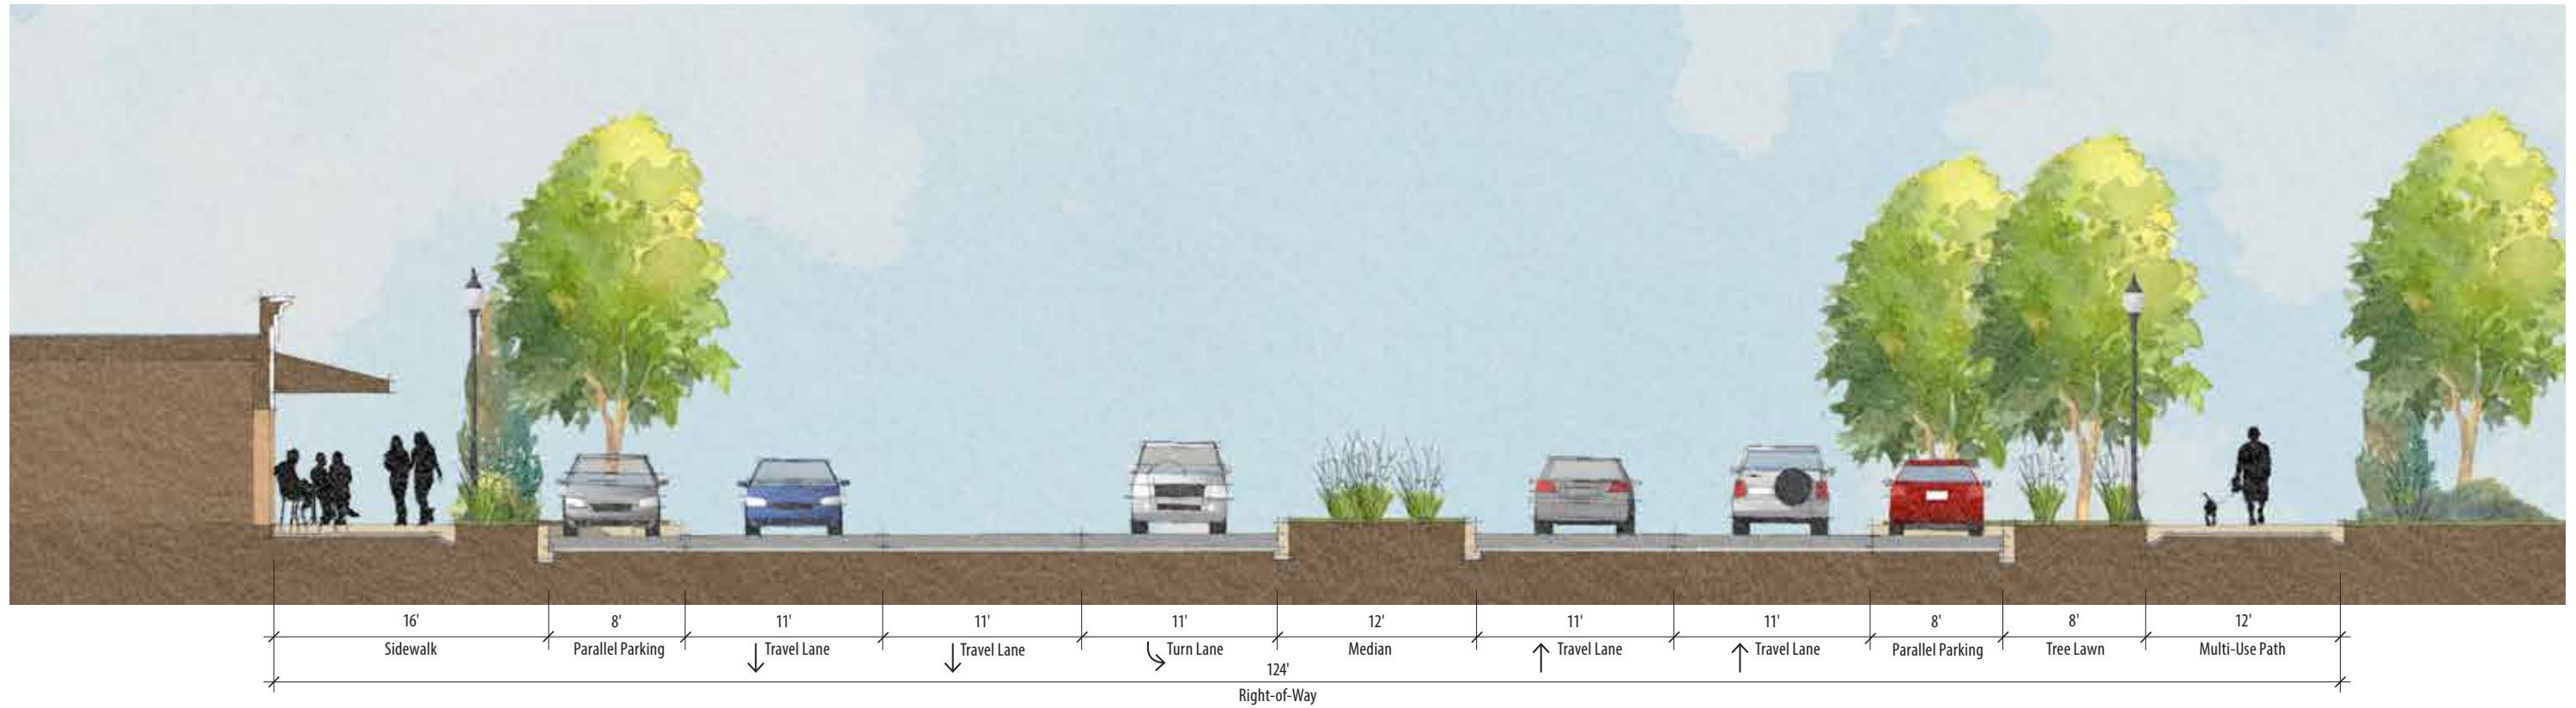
BASS LAKE ROAD PROPOSED STREET SECTION A-A Pedestrian upgrades and new on-street parking help to create a nice experience for residents.
